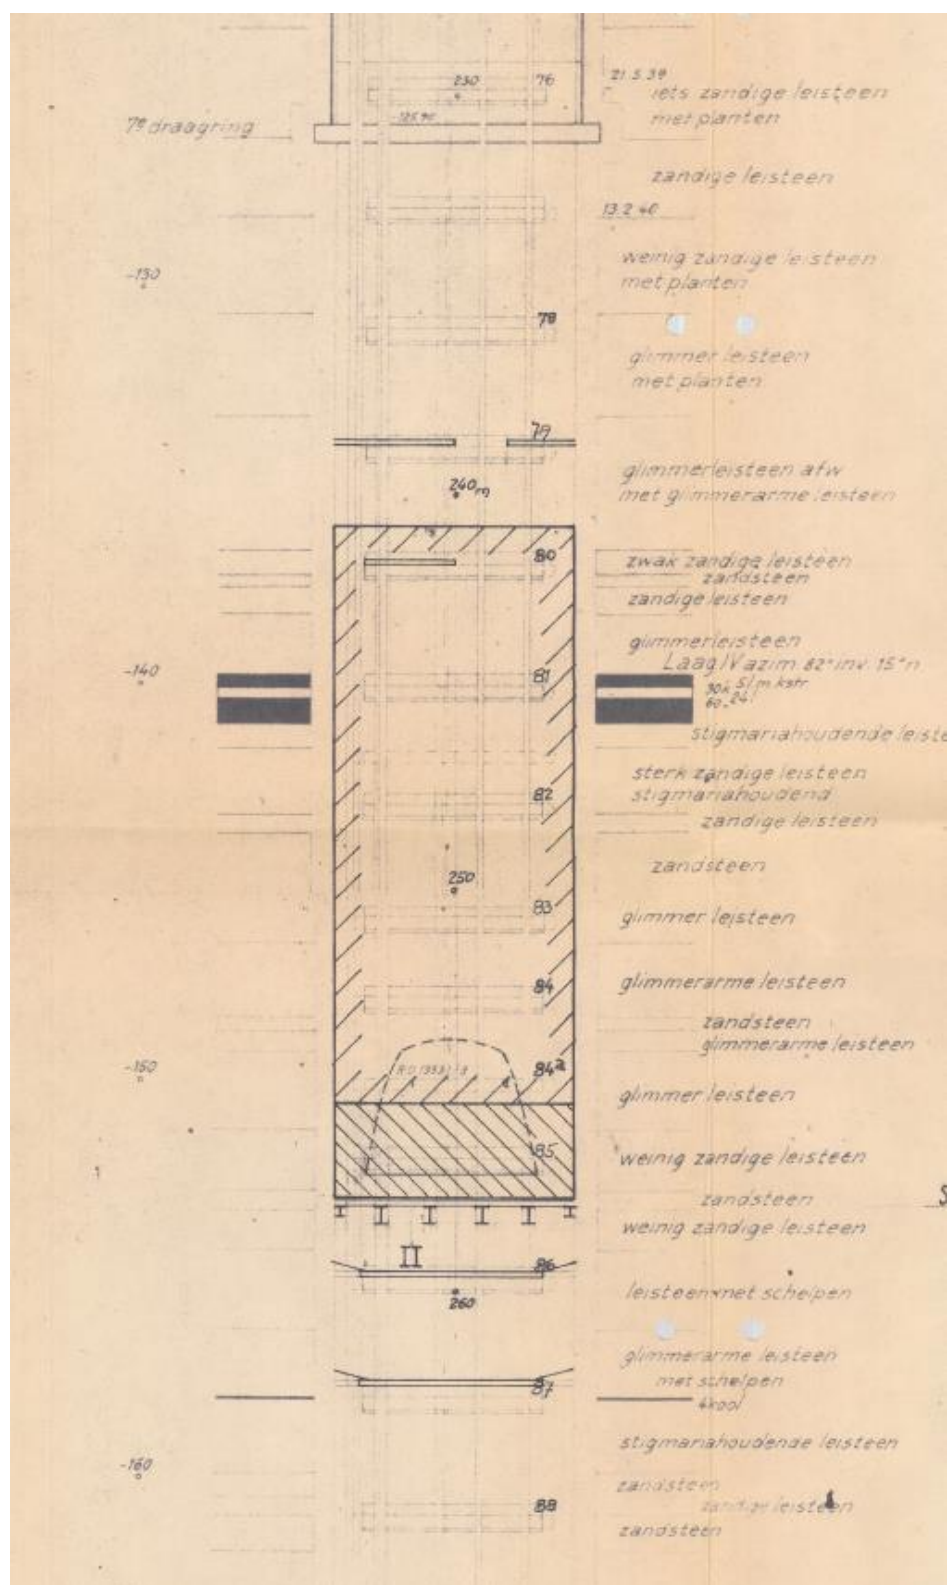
Strata shaft III Emma, 259 m floor /52/
